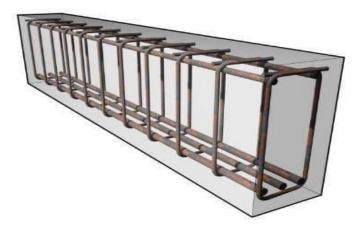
Reinforced concrete beam (Mosley, 1990)
